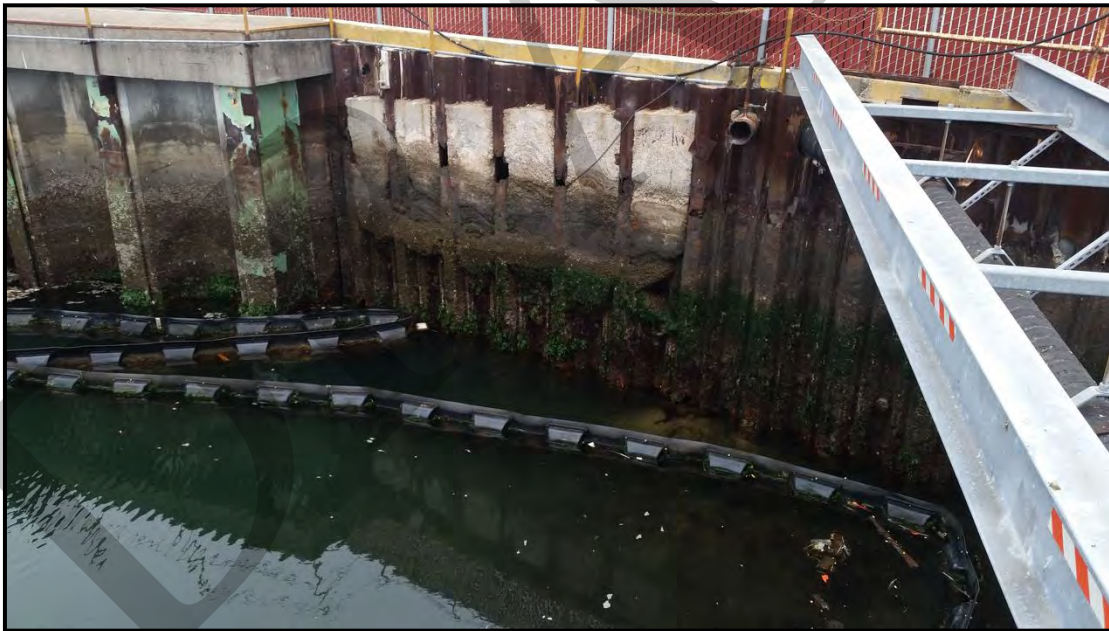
Original steel sheet pile wall at south side of Pier 1.
